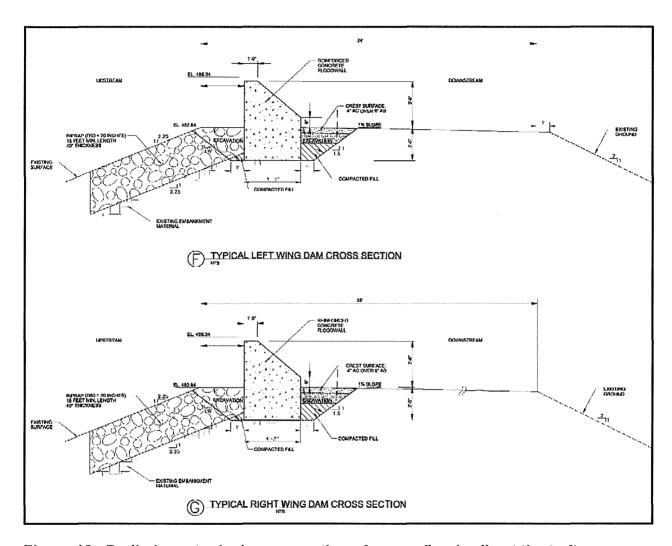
Preliminary typical cross sections for new floodwalls at the Left Wing Dam and the Right Wing Dam.
